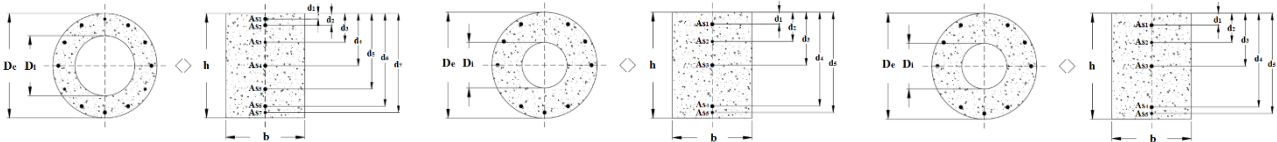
Original hollow shapes and bottom rectangular transformed shapes for bottom section (left), intermediate section (middle) and top section (right)
